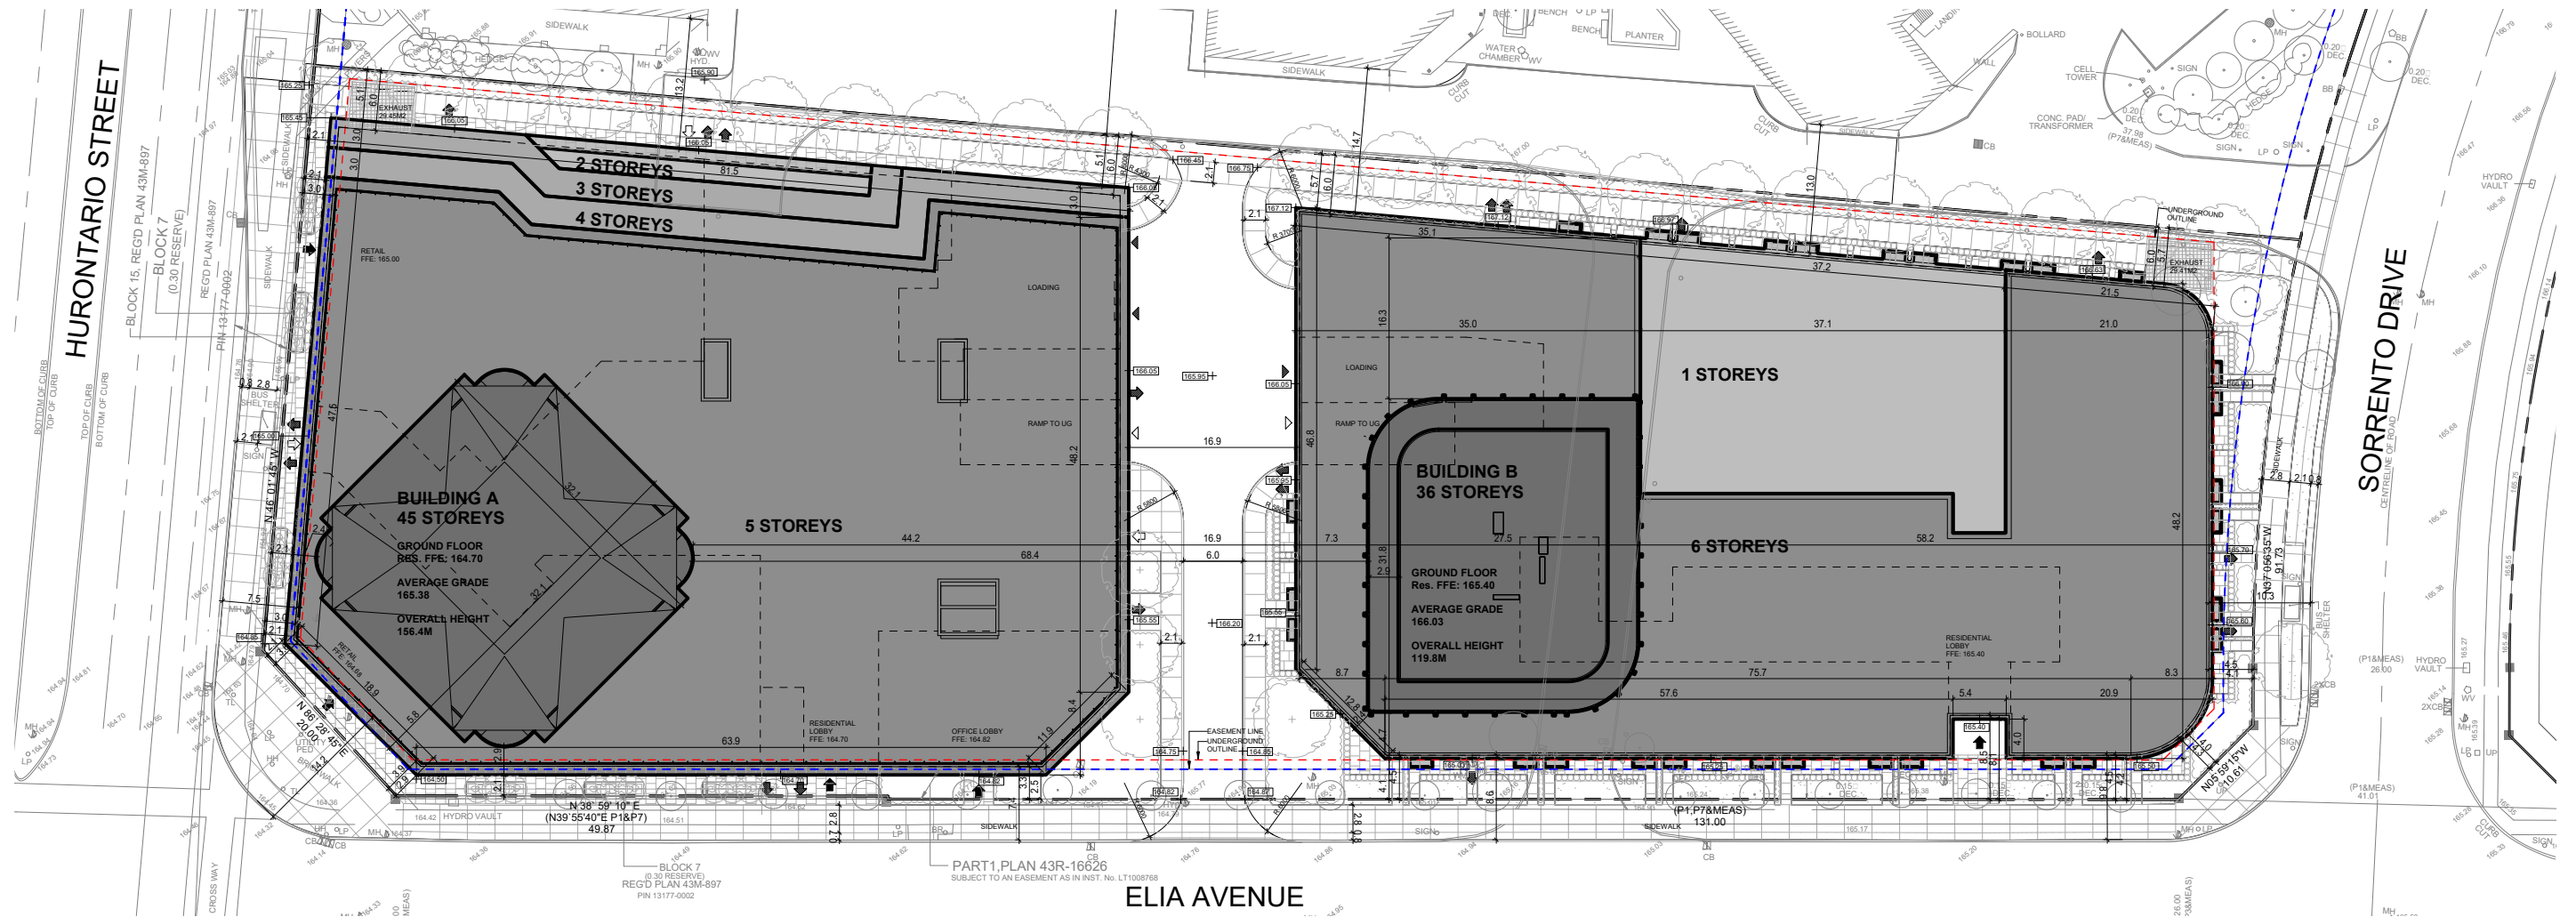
Block 1 Site/Roof Plan (Prepared by: BDP Quadrangle)
